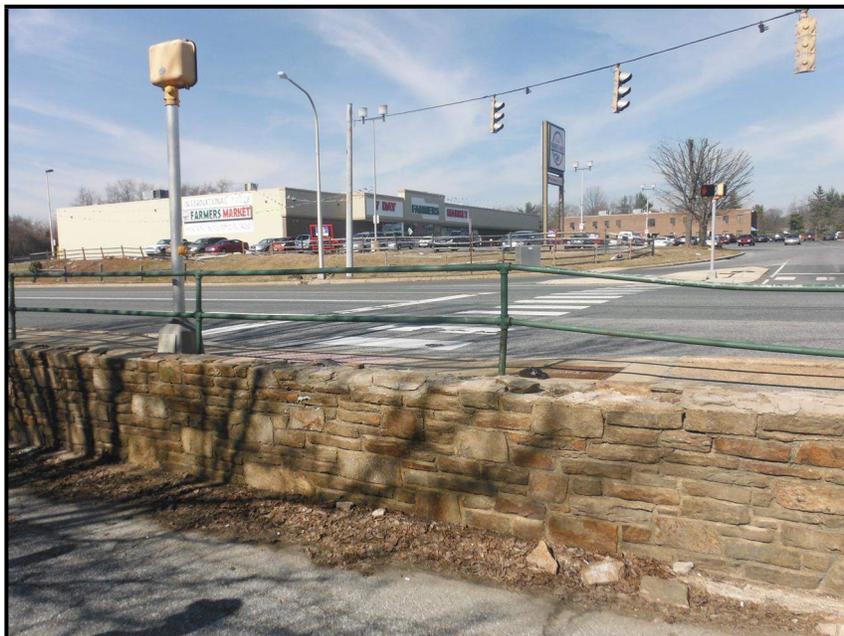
Signalized pedestrian crossing at 7 Day Farmers Market Intersection
